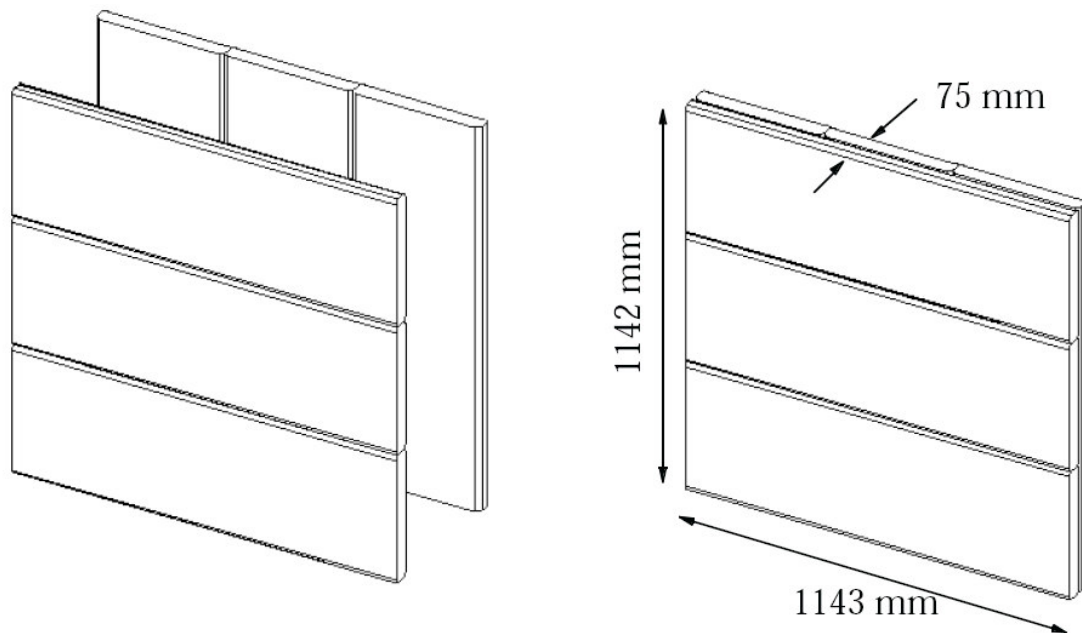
b: A double layer built-up lumber specimen consisting of six planks.
